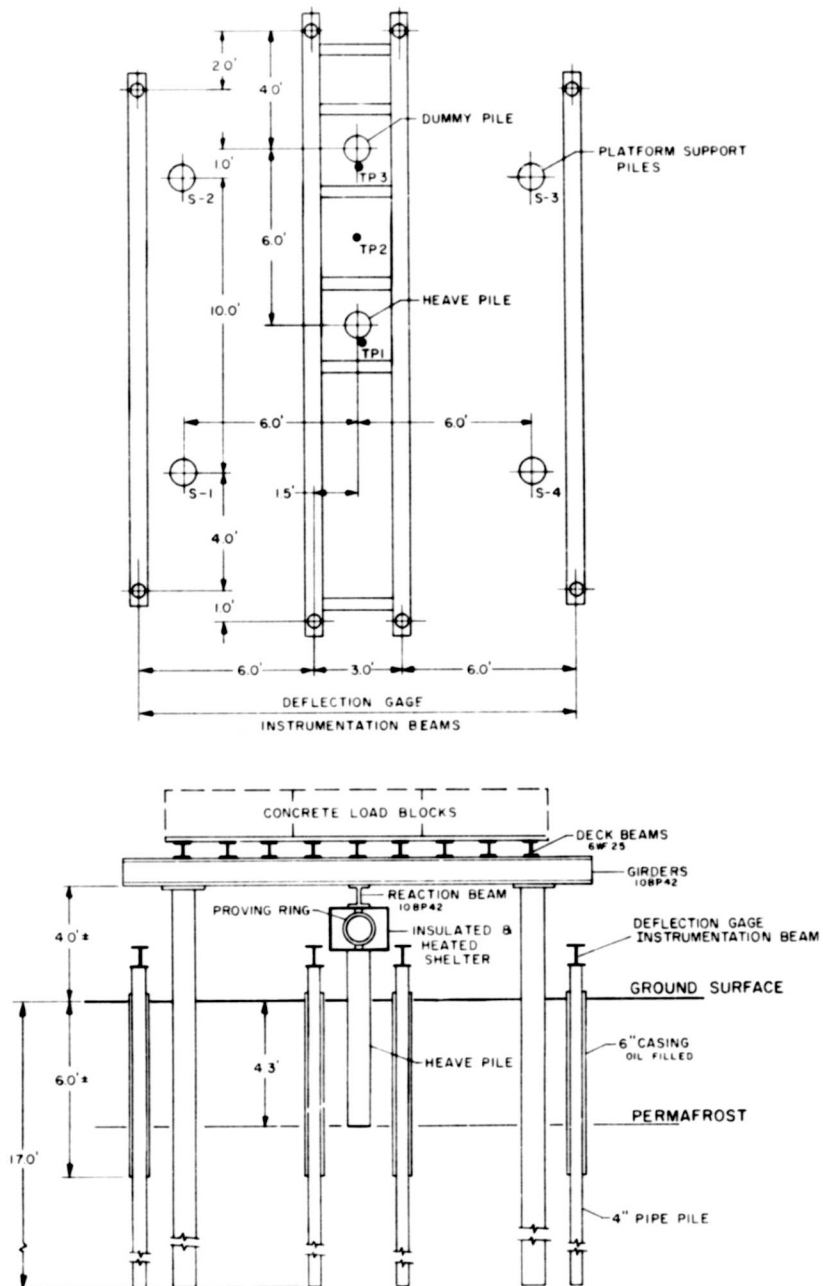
Plan and elevation view of 1957-58 heave test installation.
